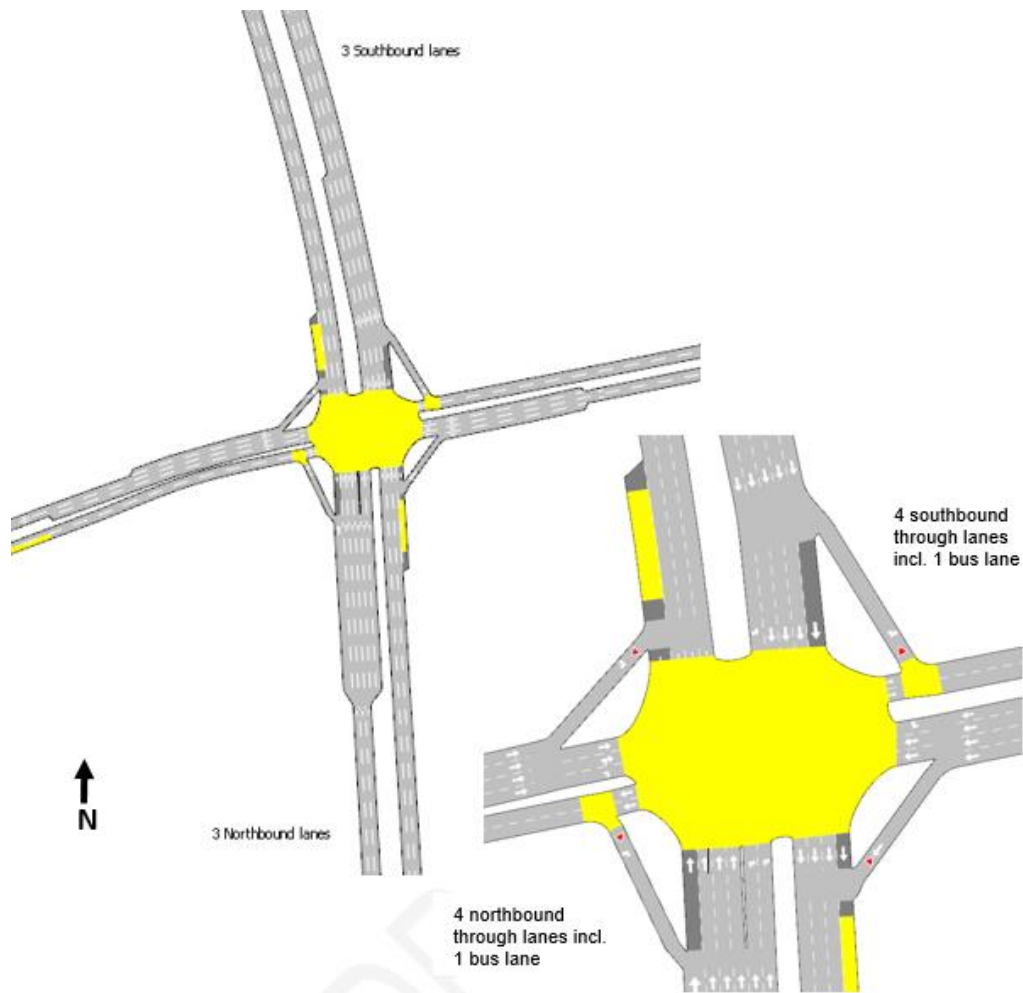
Assumed upgrades at Richmond Road and Townson Road (2036)
